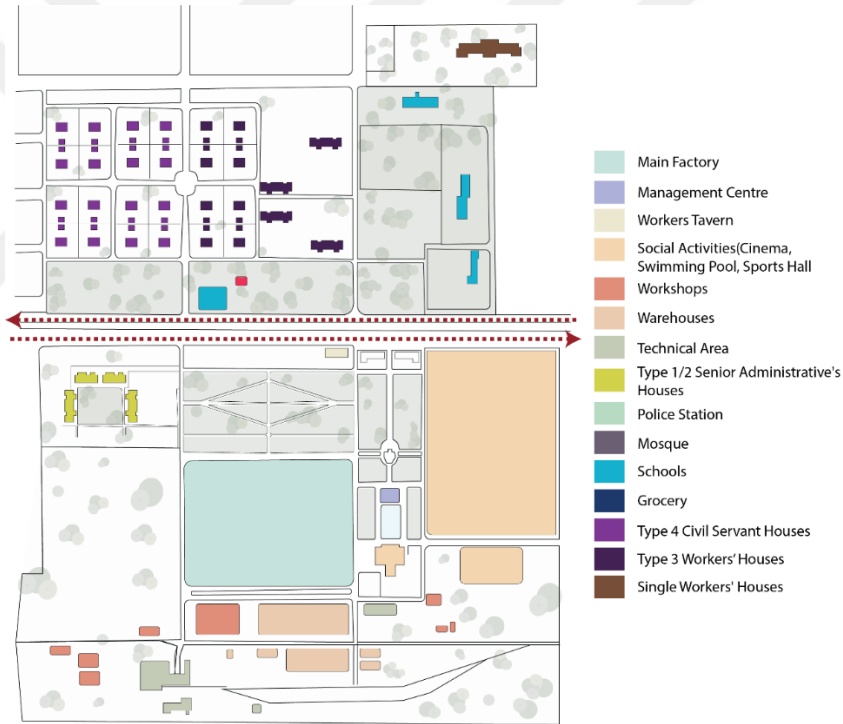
15. Kayseri Cloth Factory Site Plan (Drawing by Merve Köz, original plan from Asiliskender, 2002, p. 78)
